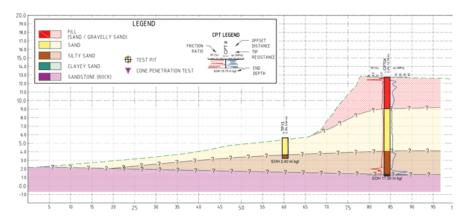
Cable Beach - Typical Geotechnical Profile of Beach and Dune
